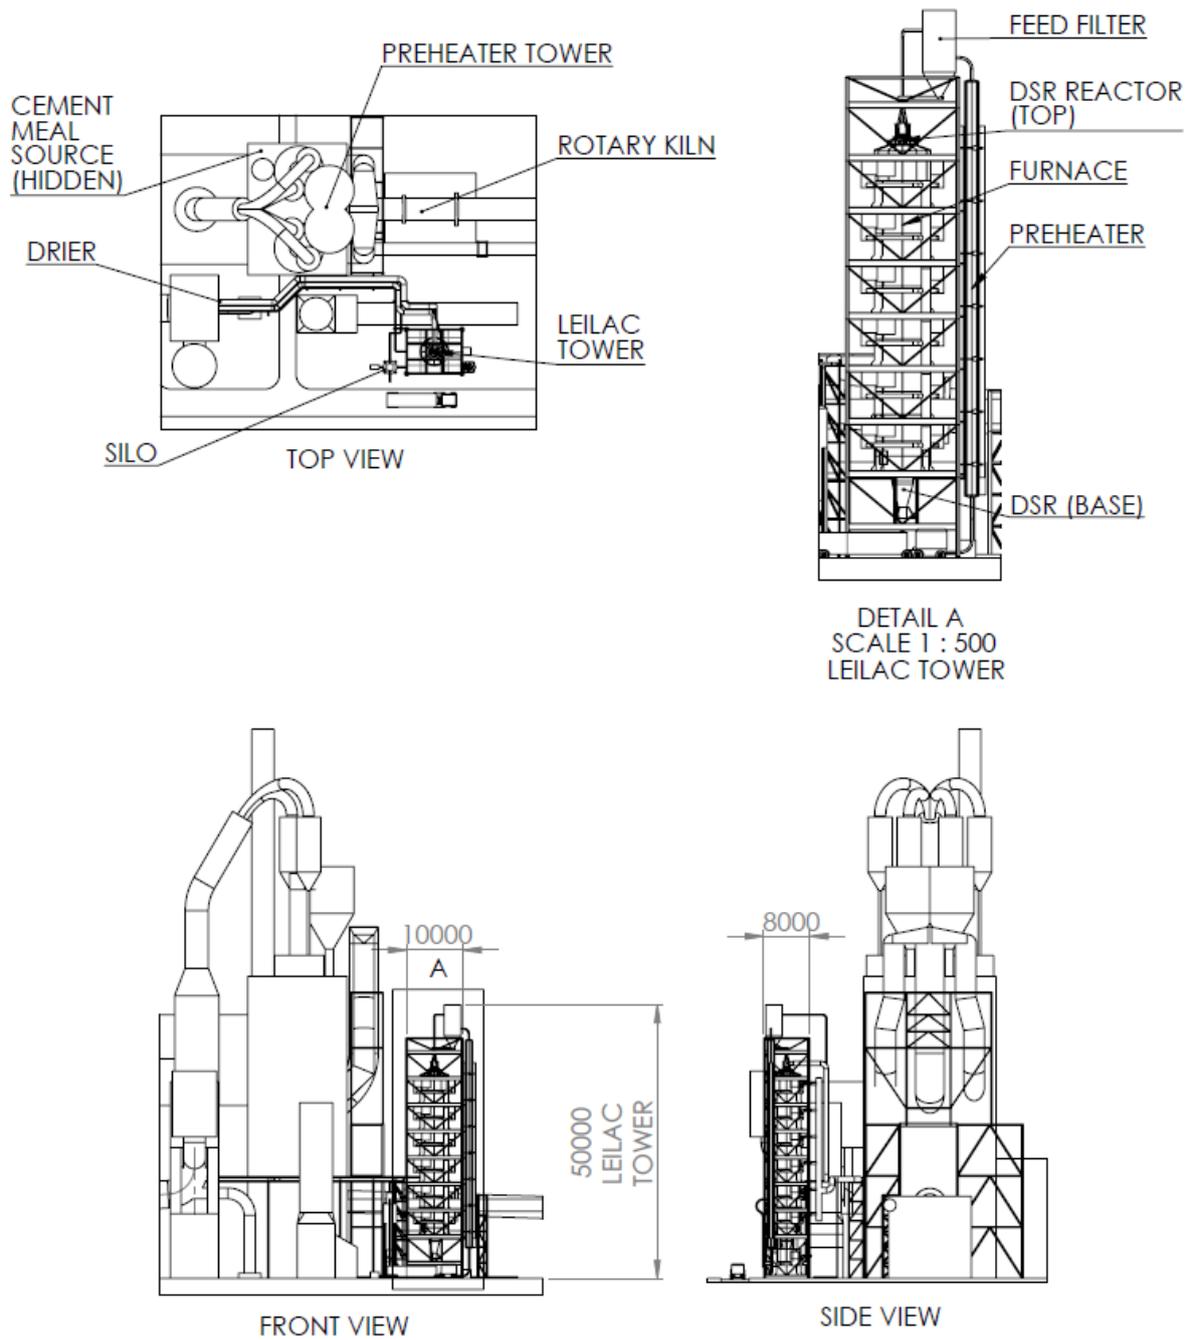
Tower, shown within existing CBR Lixhe cement plant
